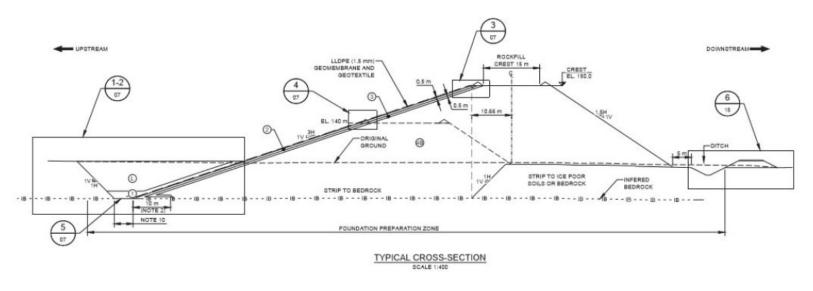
Typical Cross-Section of Saddle Dams 3/4/5
